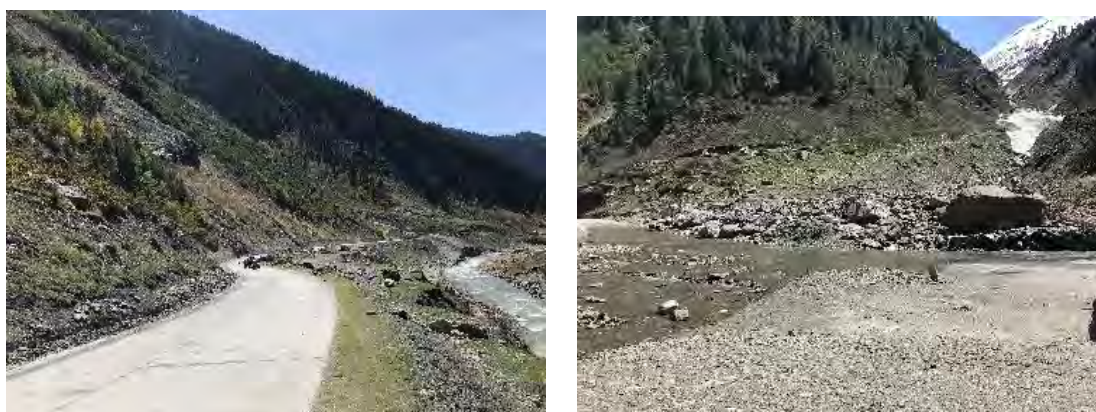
Examples of Concrete Pavement (N15\_8) and Inverted Pavement to Minimize the
